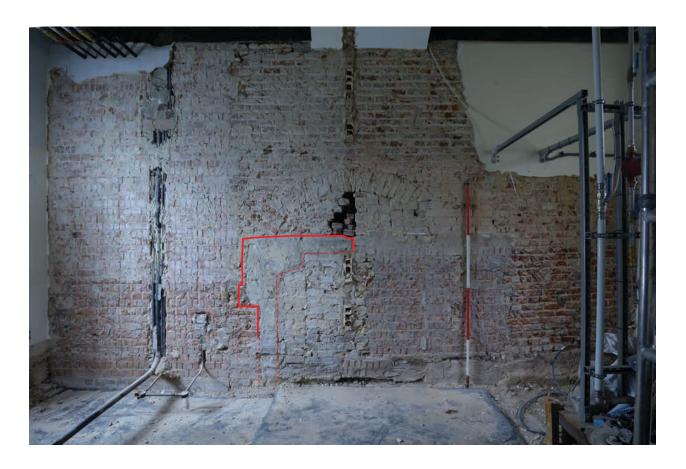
Photograph facing northeast within the Porter's Lodge, showing the flat-laid peg tile utilised in facing the window embrasure in the east wall and a portion of the masonry footing for the original eastern staircase exposed below floor level
